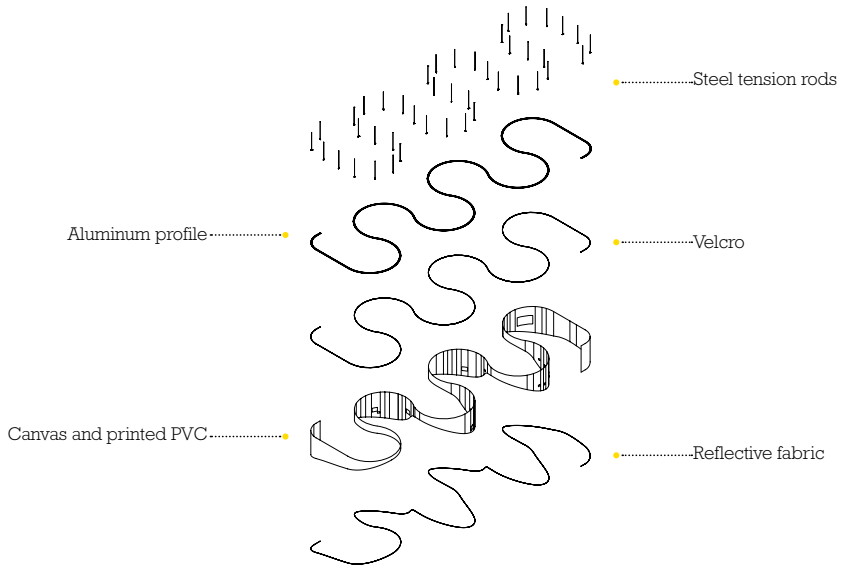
Construction detail - Main components of the arrangement | Axonometric exploded view.
